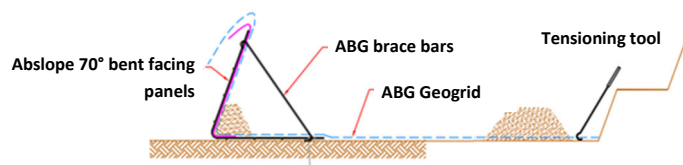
Brace bars fixed, geogrids tensioned at the back of the slope against layer of fill load to remove slack
